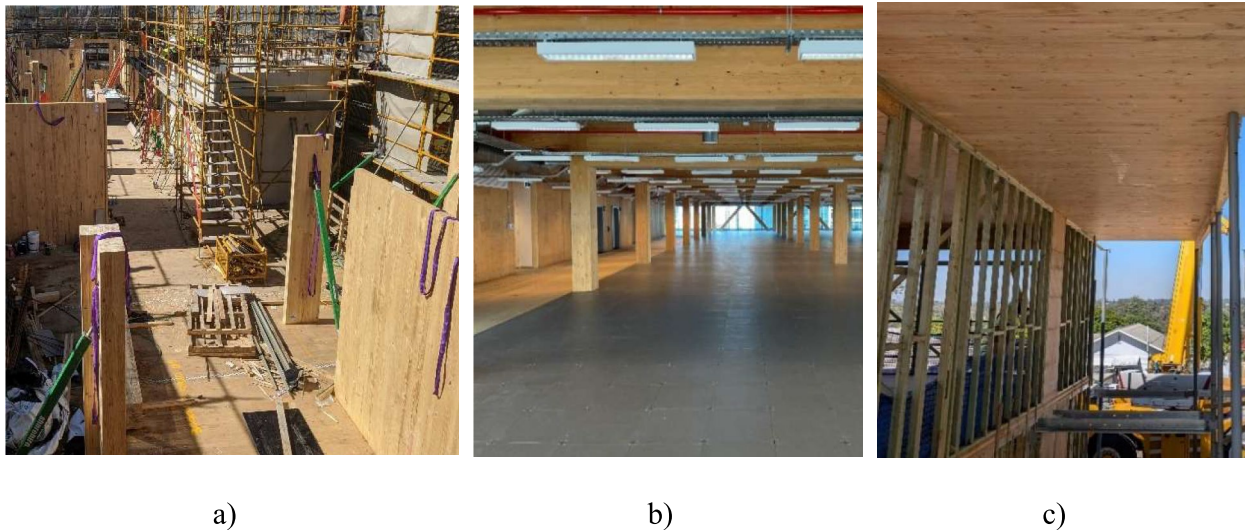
Three common mass timber building construction methods viewed: a solid wall option, b post-and-beam design, and c solid mass timber (CLT) floor with light weight framing walls
